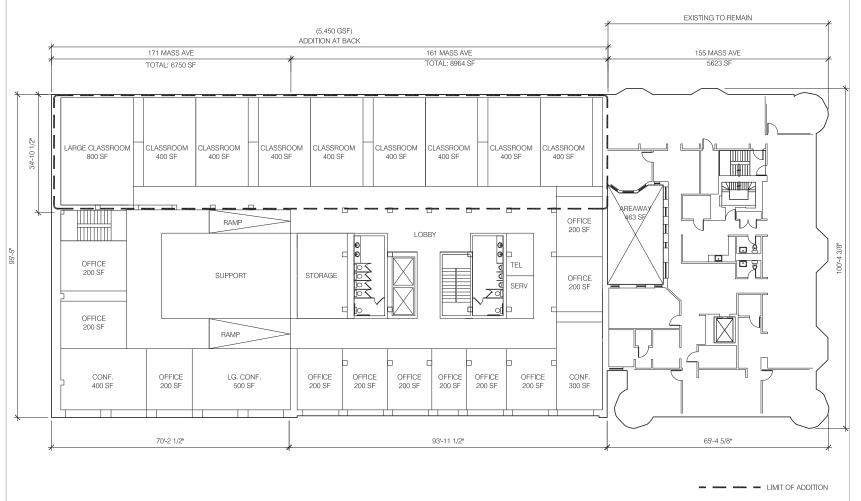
161-171 Mass Ave Typical Upper Floor Plan
